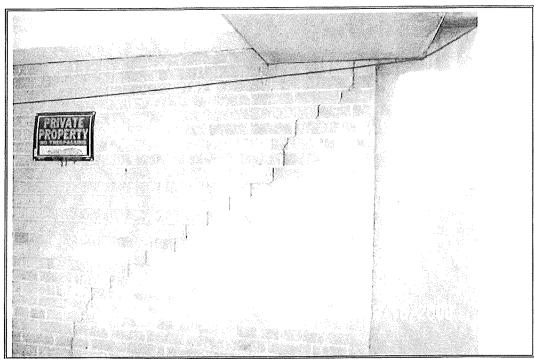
Photograph Number 13: Masonry veneer cracks and spalling.
